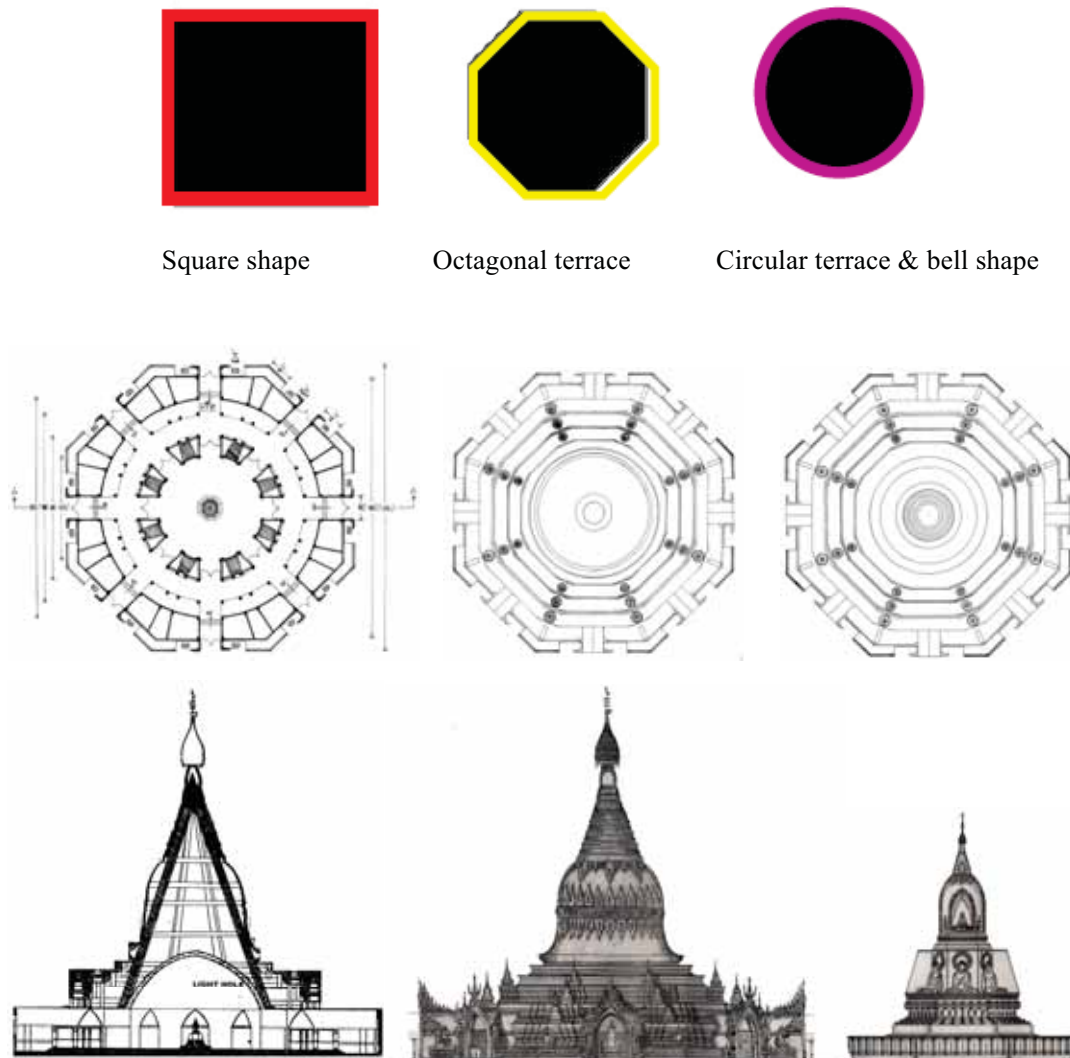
Ground plan shape, section and elevation of Maharwizaya temple in Yangon - 1980
